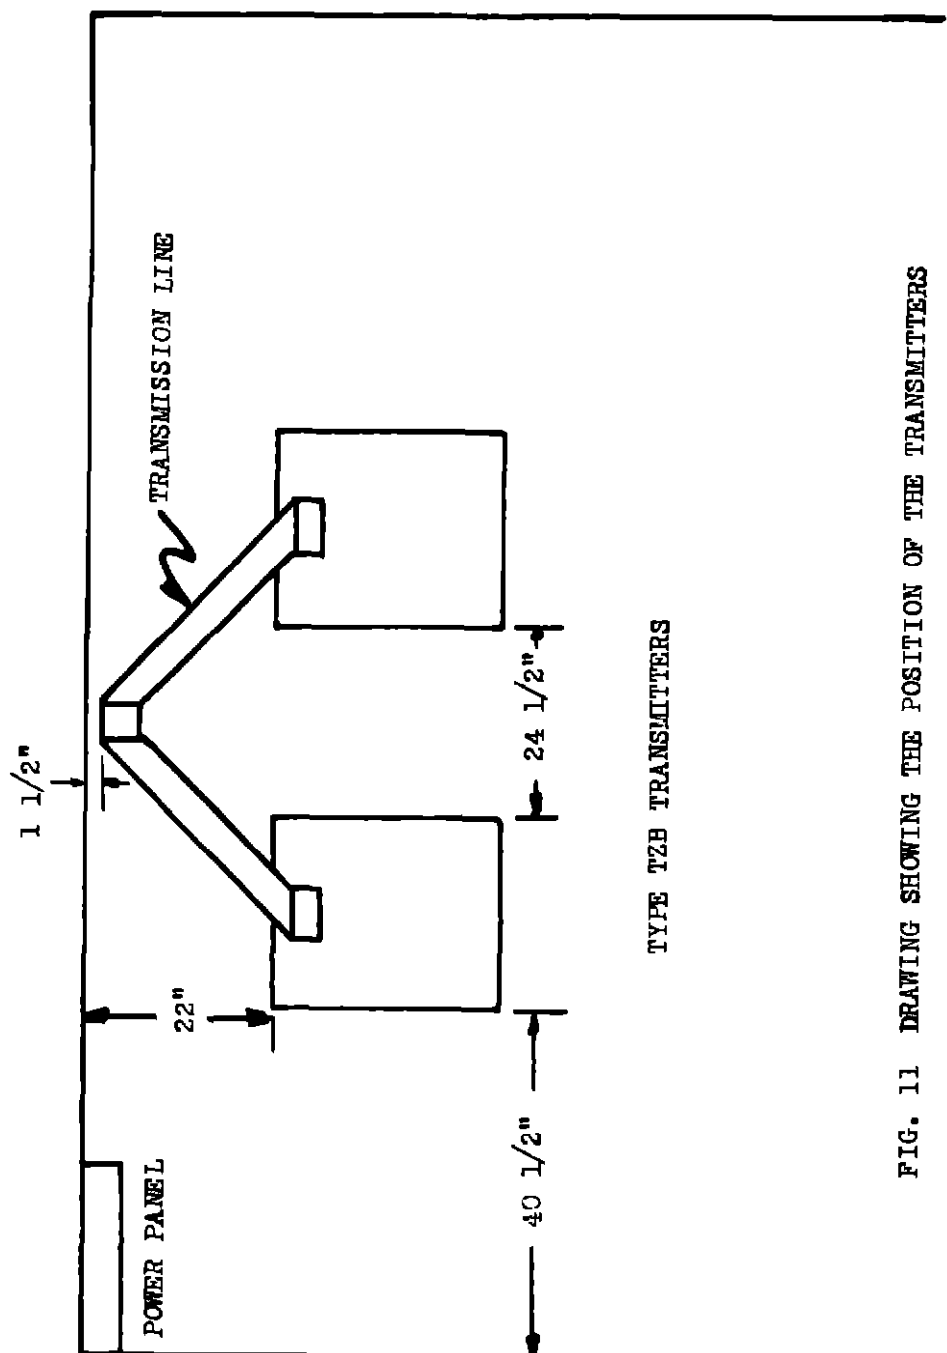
DRAWING SHOWING THE POSITION OF THE TRANSMITTERS
